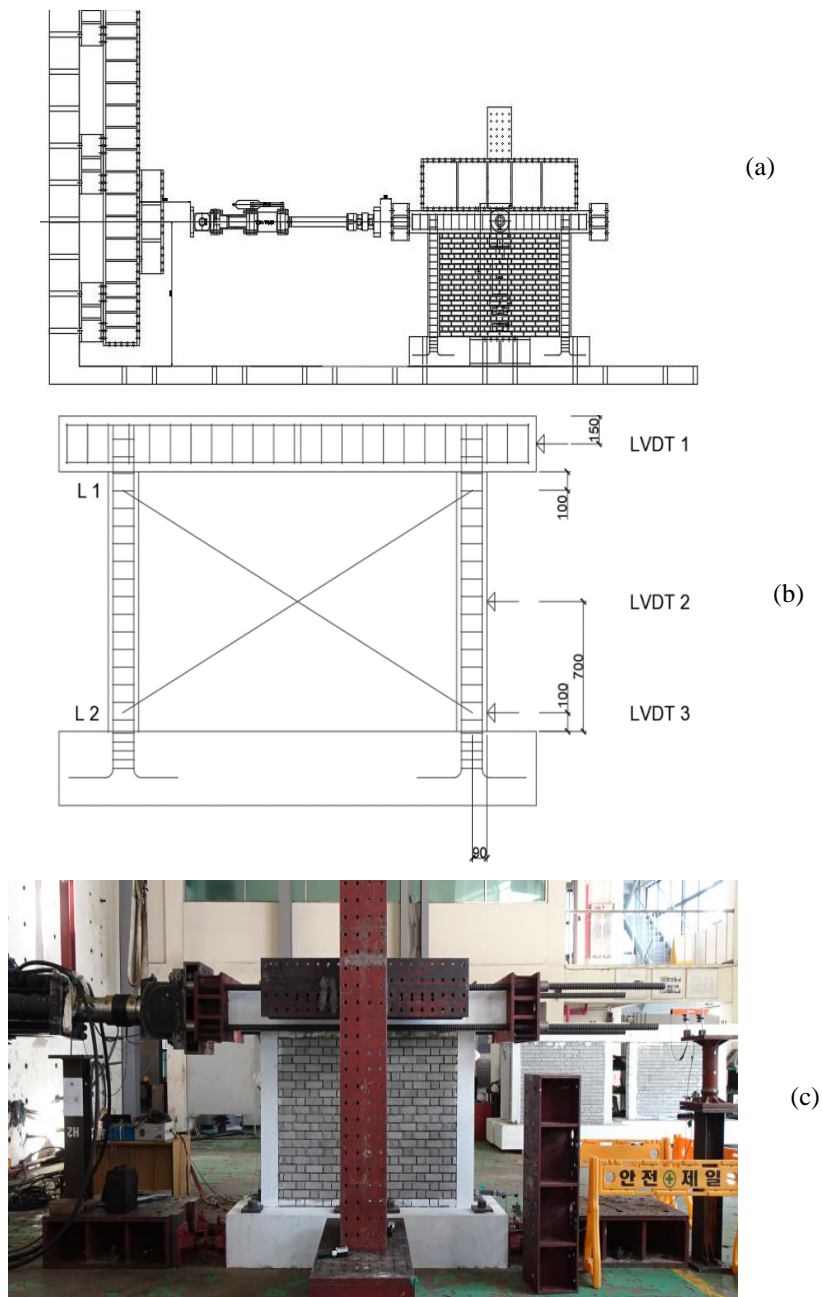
Specimen and loading test apparatus: a) loading system; b) installed sensors; c) photo of specimen and loading system
